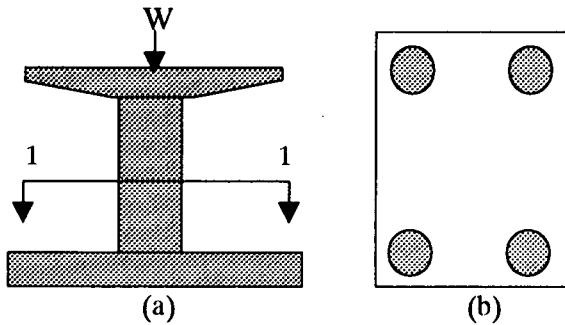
(a) Bridge pier model and (b) cross-section at 1-1
